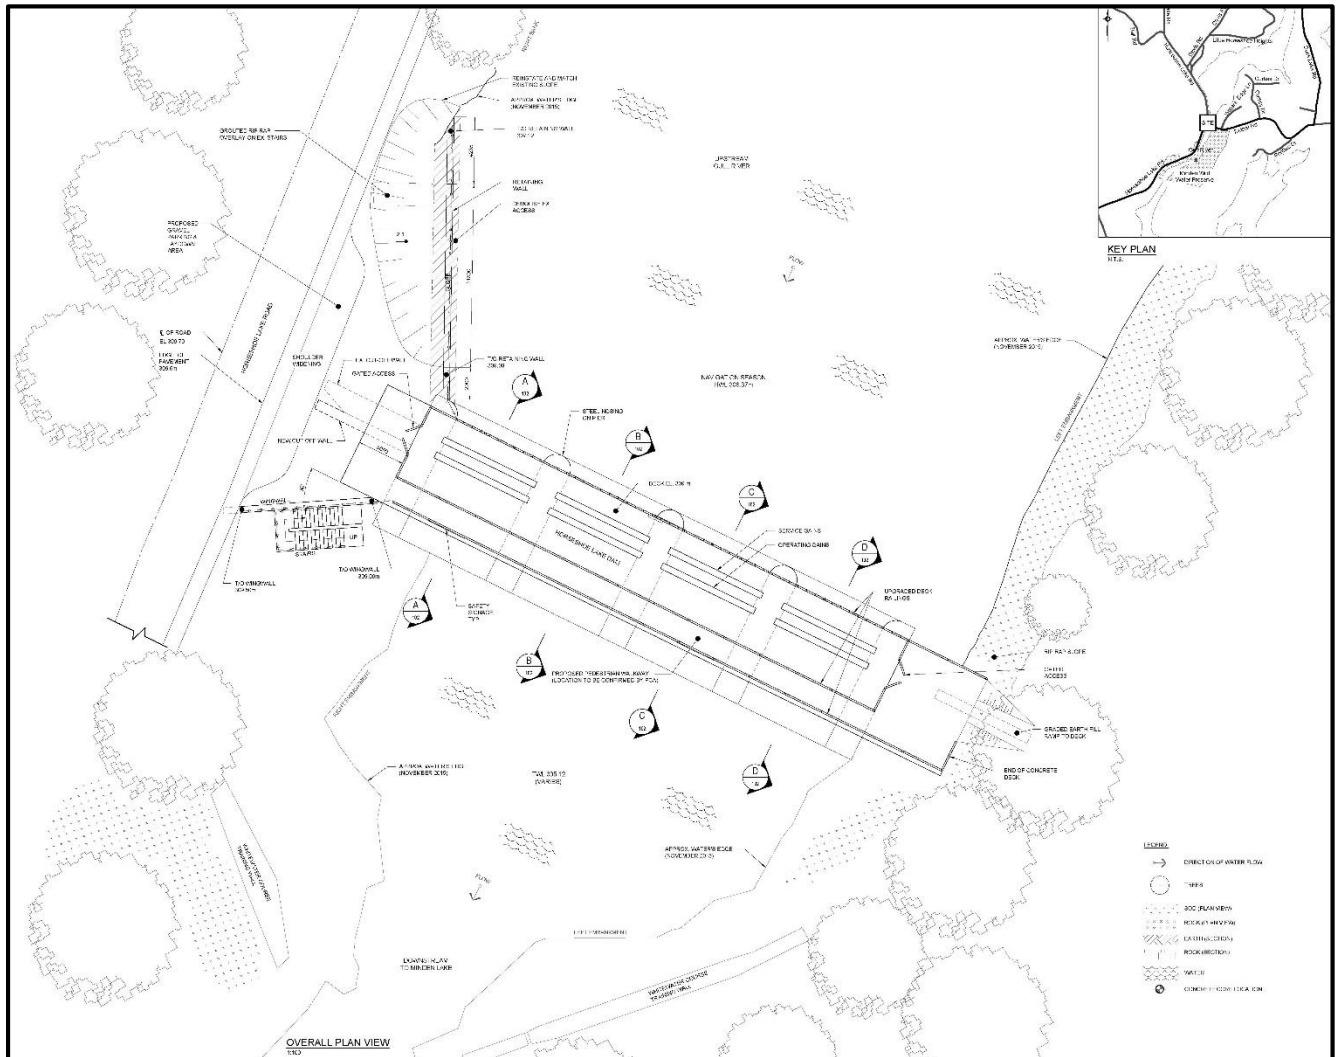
Horseshoe Lake Dam Replacement Project (WSP 2016b). Locations of proposed retaining wall, gravel parking lot and lay down areas shown.
